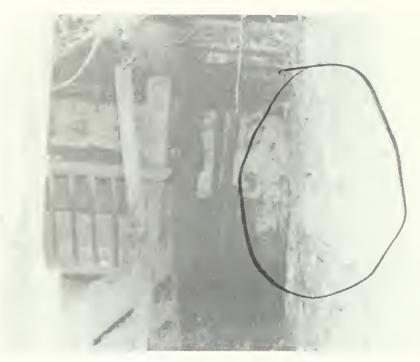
Bowing of the wall was evident as far back as 1985, as is apparent in this photograph.
